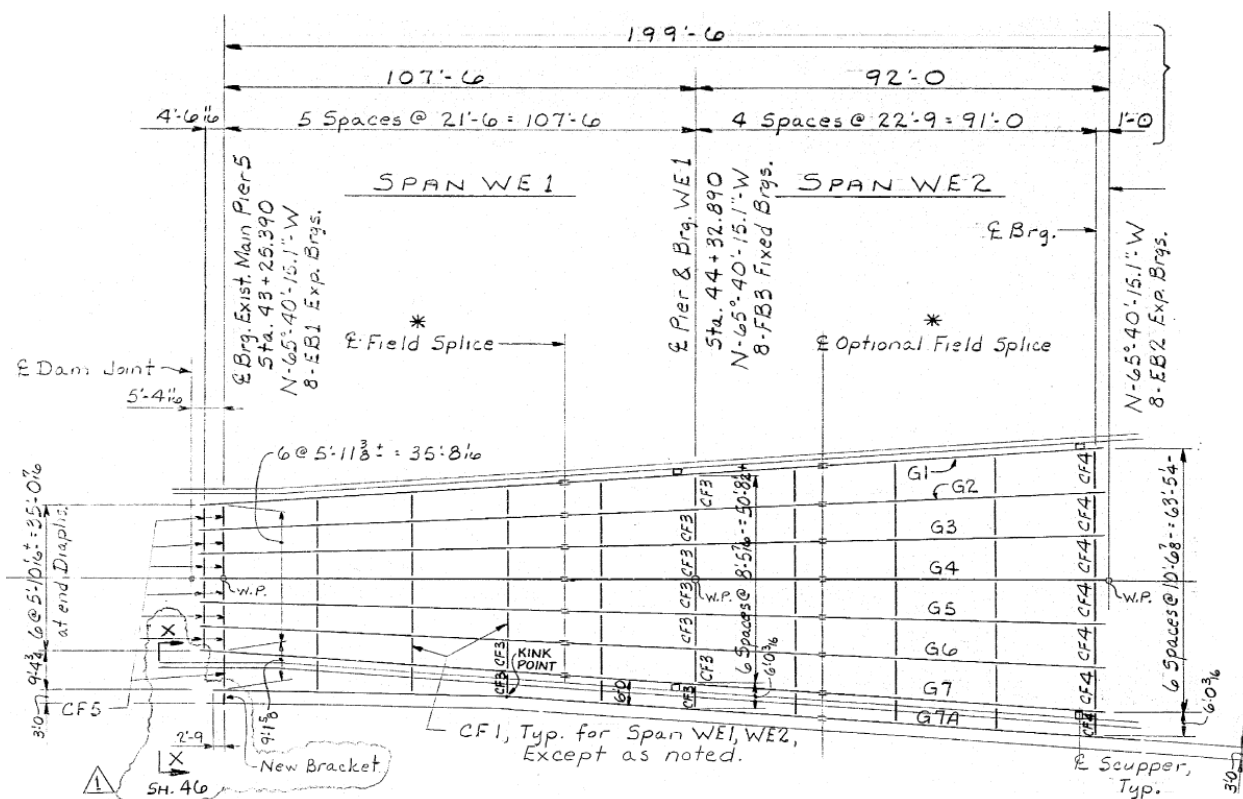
Example of a Splayed Girder Bridge
